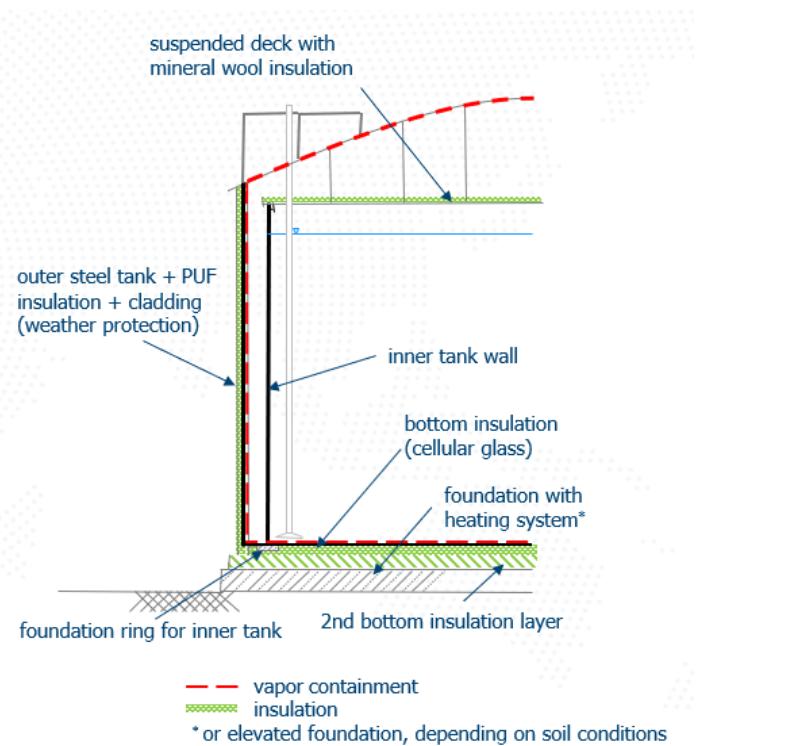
Typical arrangement of a full containment cryogenic ammonia bulk storage tank
